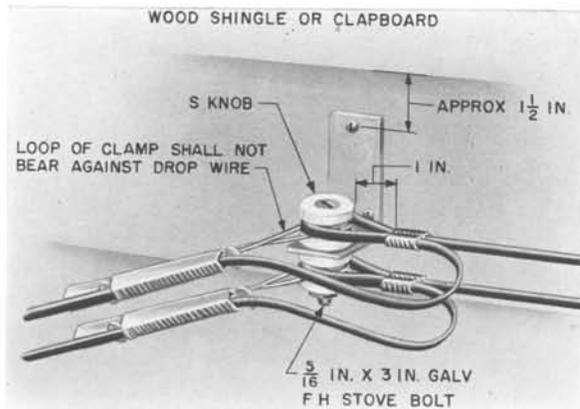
FIRST ATTACHMENT—HOUSE BRACKET
